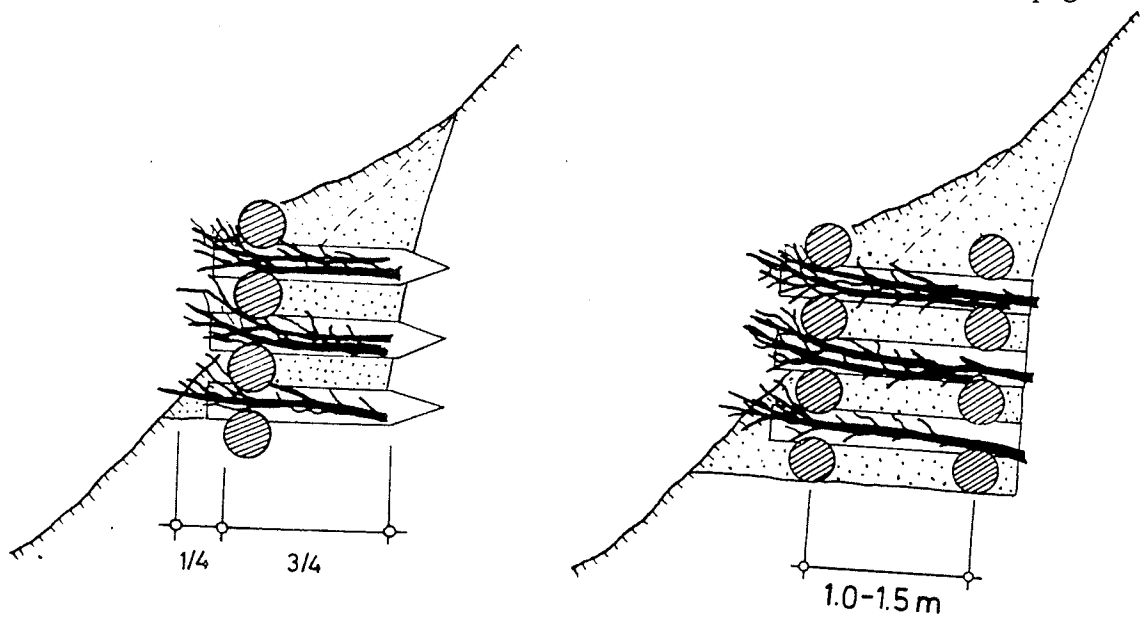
Diagram of a live wooden crib wall. Left: single walled. Right: double walled.
